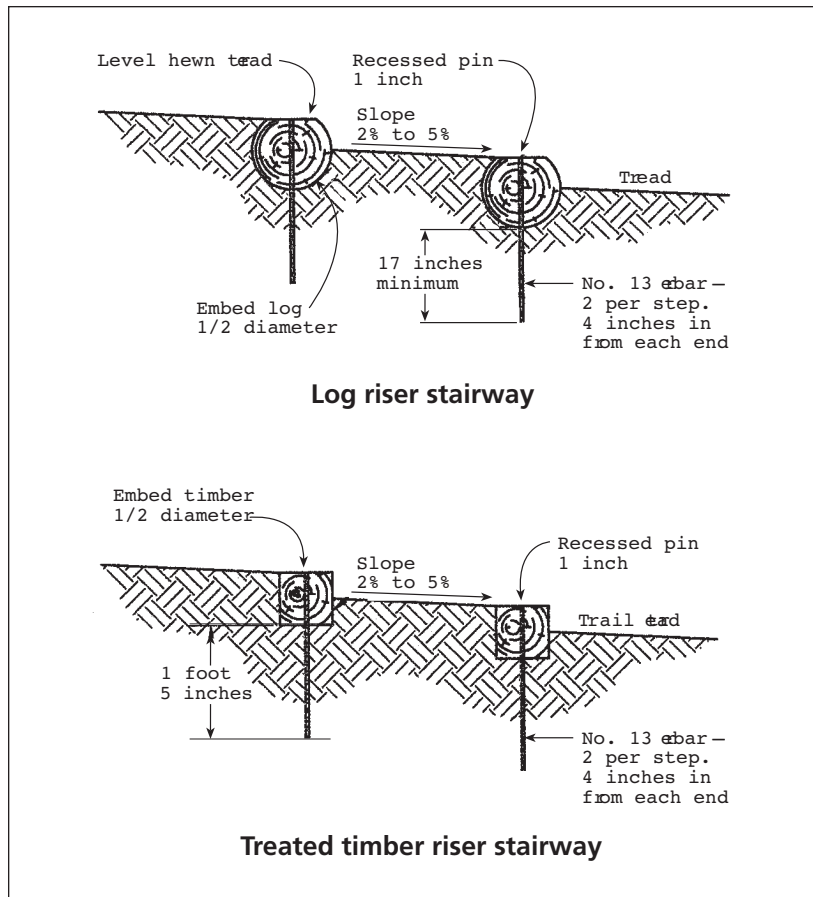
Log and treated riser stairways. (Jackson, B. 1993. Recreation Site Design)
